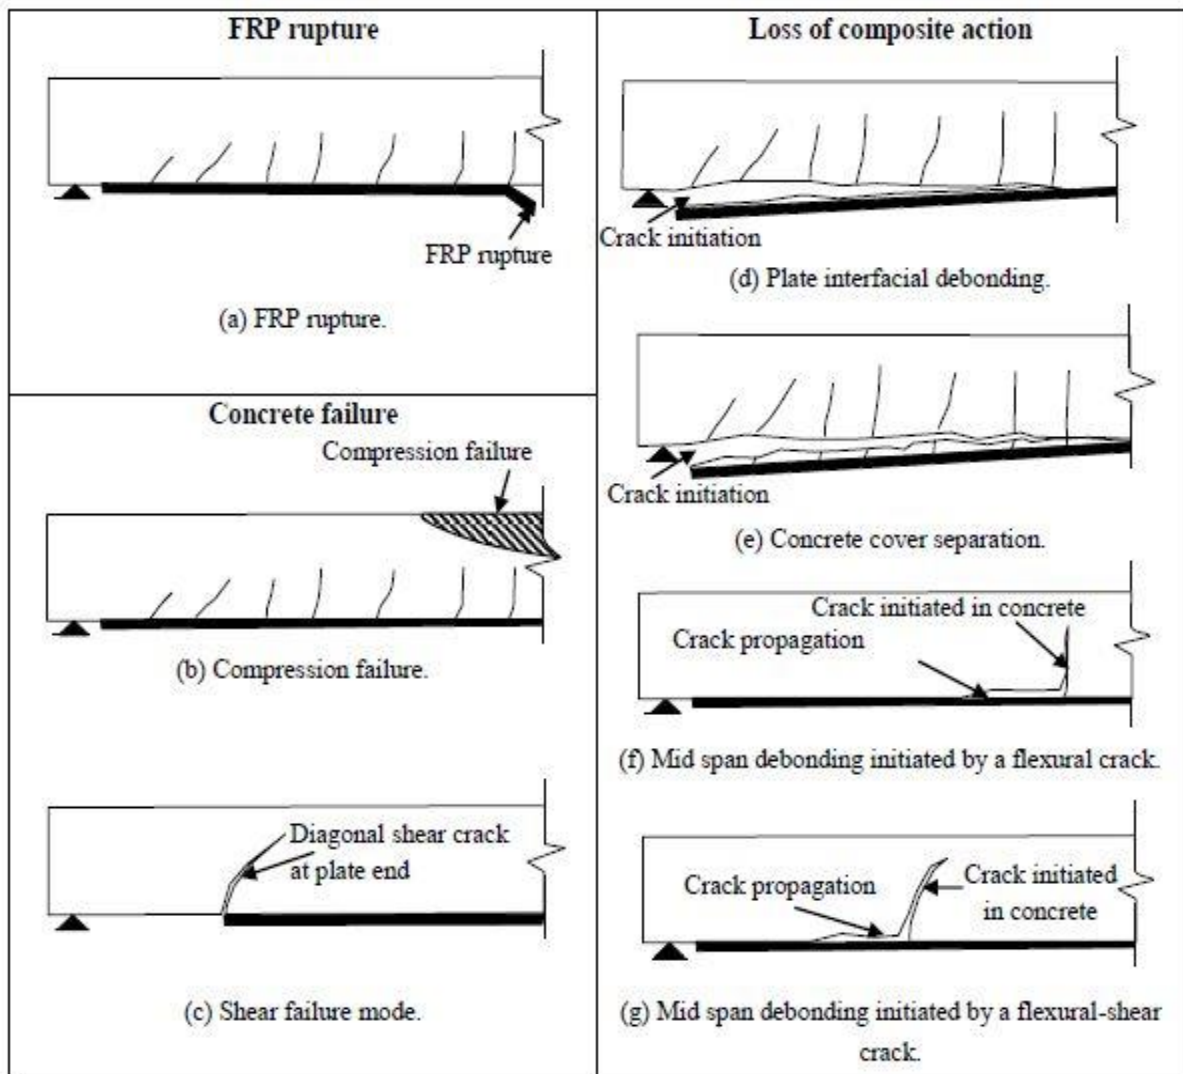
Various modes of failure in externally bonded FRP reinforced concrete beams (Obaidat, 2011)
